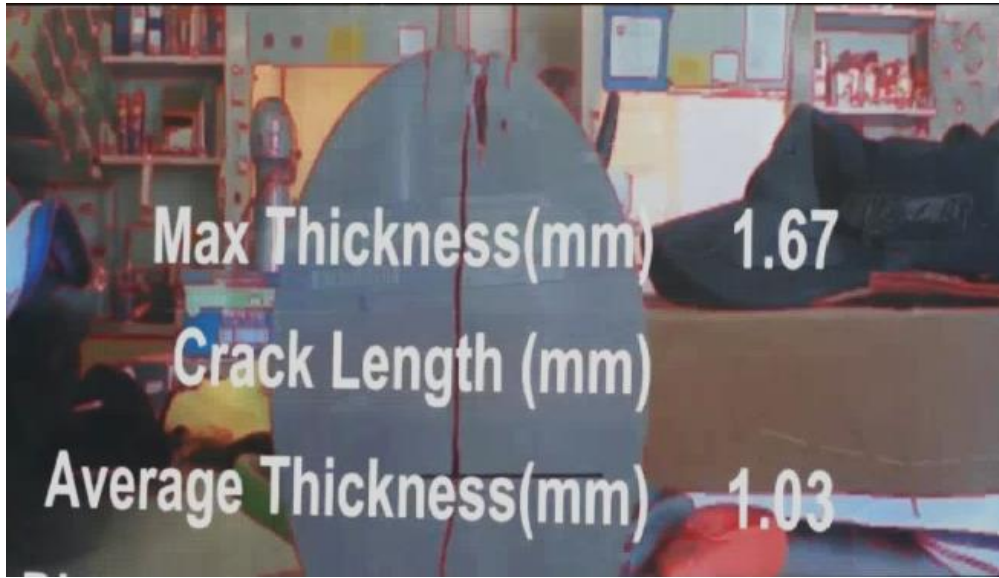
App reading of 5 cracked cylinder in real crack measurement experiments.
